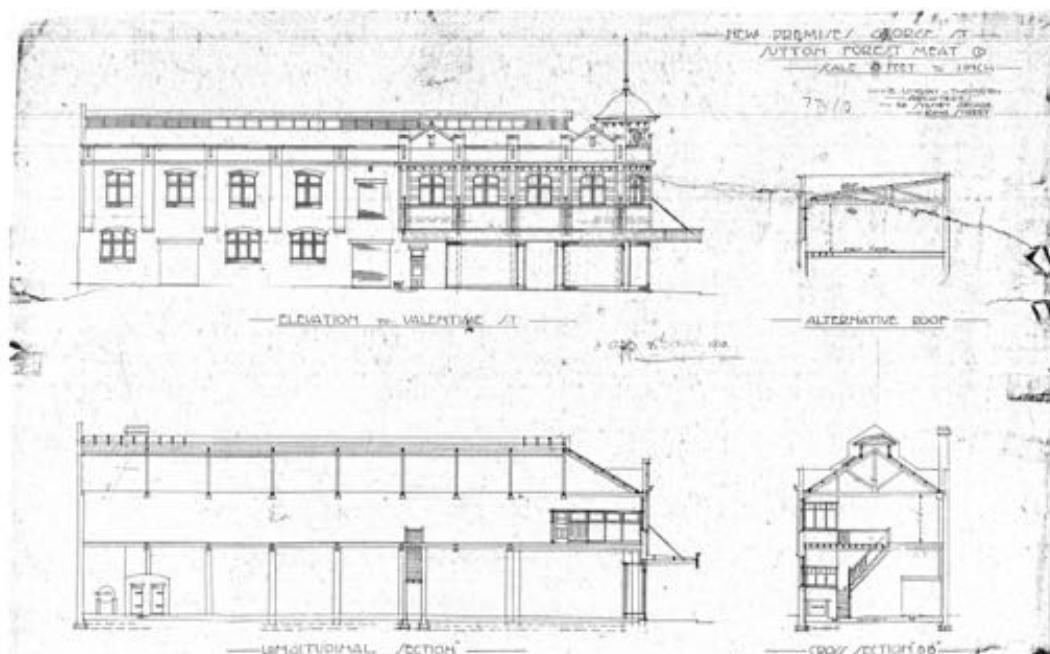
Original architectural design drawings for Sutton Forest Meat Co building by E. Lindsay Thompson Architect, 1910. Note alternative roof design and corner turret. (Source: Sydney City Archives, Building Application plans 0221/10)
